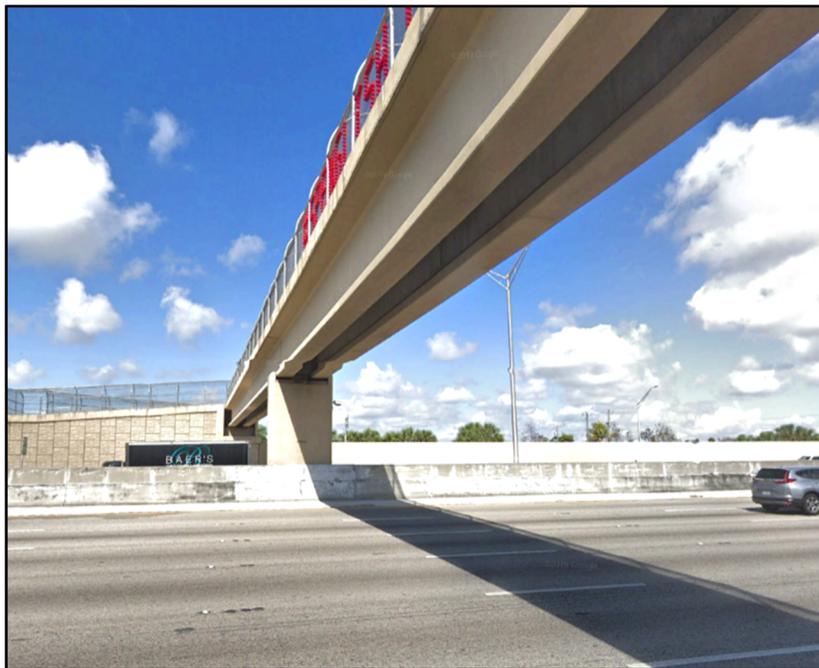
Bridge 870923, Pedestrian Overpass at SR826
